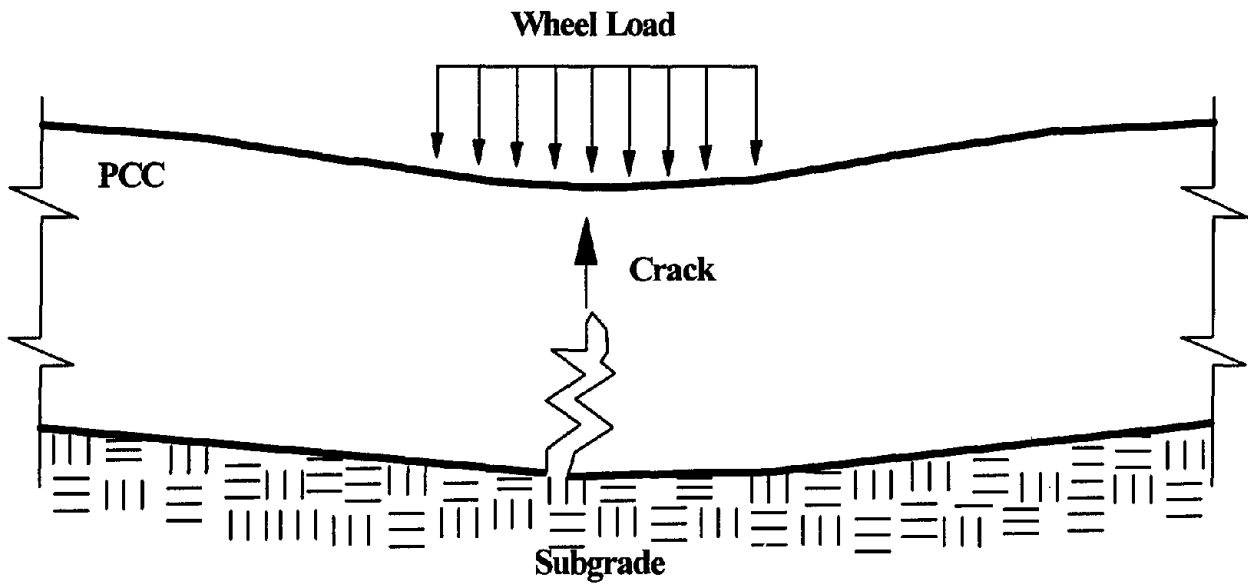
Pavement deformation with wheel load placed directly over the plane with the crack.
